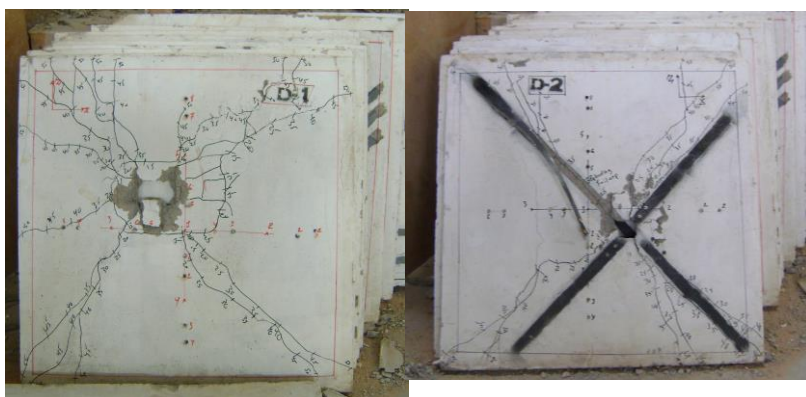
Crack pattern after failure for series (C) slab specimen.
